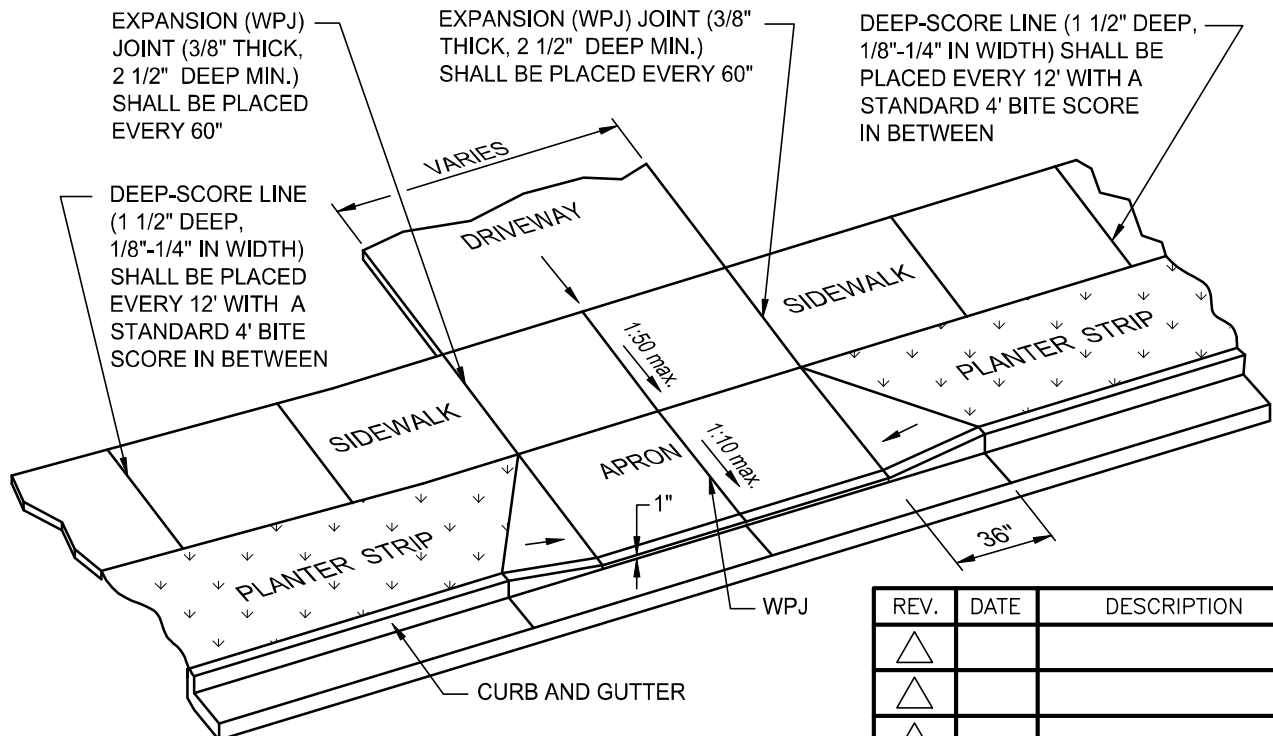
DRIVEWAY CROSSING LANDSCAPE STRIP
